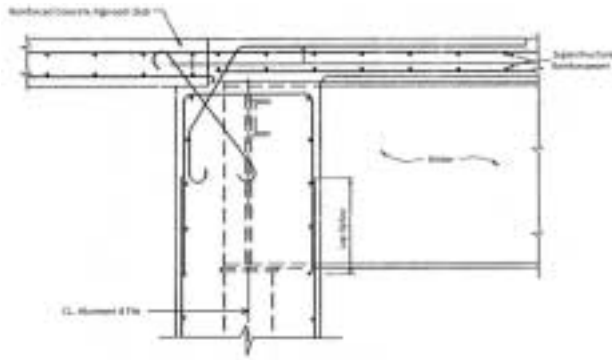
Integral Abutment Detail. Note formed rebar to establish connection between the abutment beam and the approach slab.
